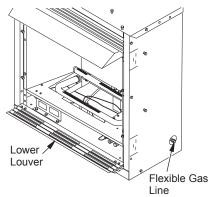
Flexible Gas Line Location (Remote-Ready Unit Shown)
